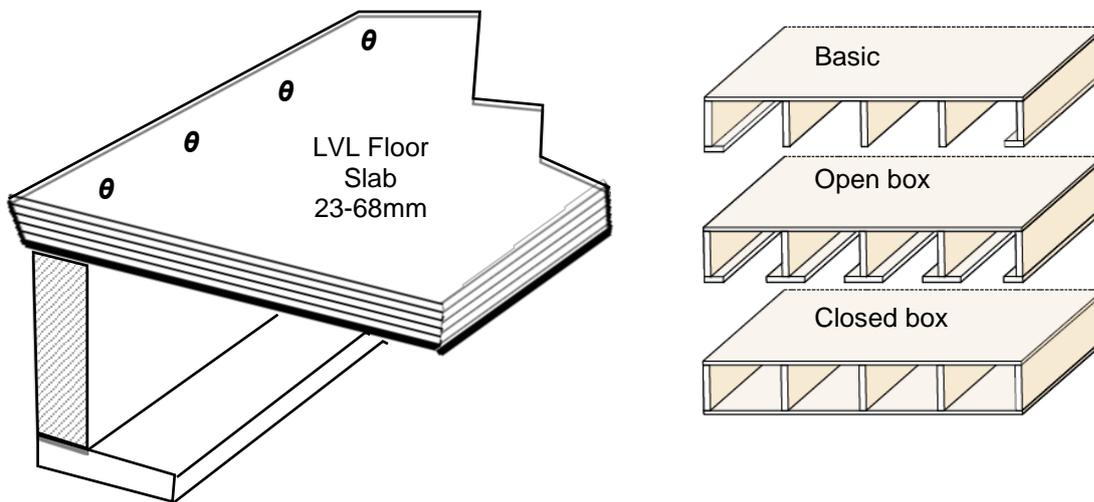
LVL Rib Slab – prefabricated floor cassette module options
